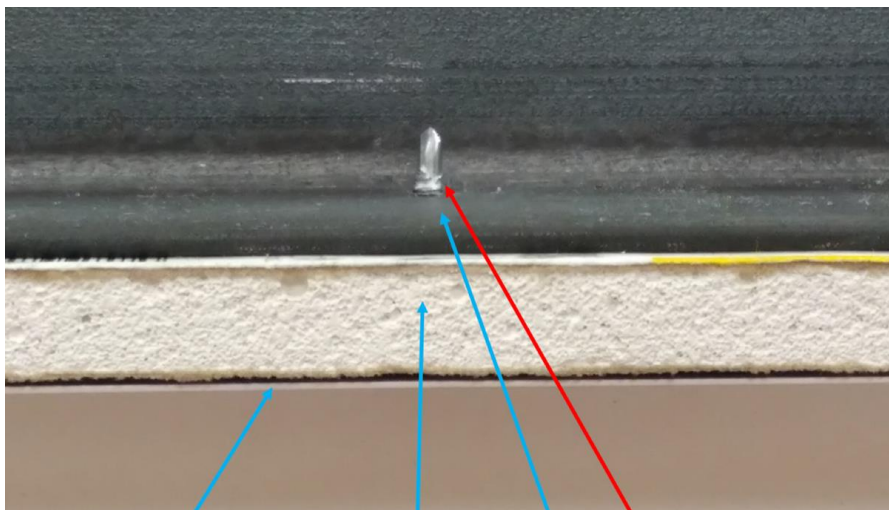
Hard Ceiling Mount, Flange/Sheet Rock/Structural Ceiling Beam
